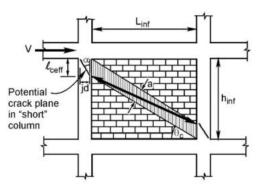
Short column due to columns restrained by full-bay masonry infill walls (NZSEE study group on earthquake risk buildings, 2006)
